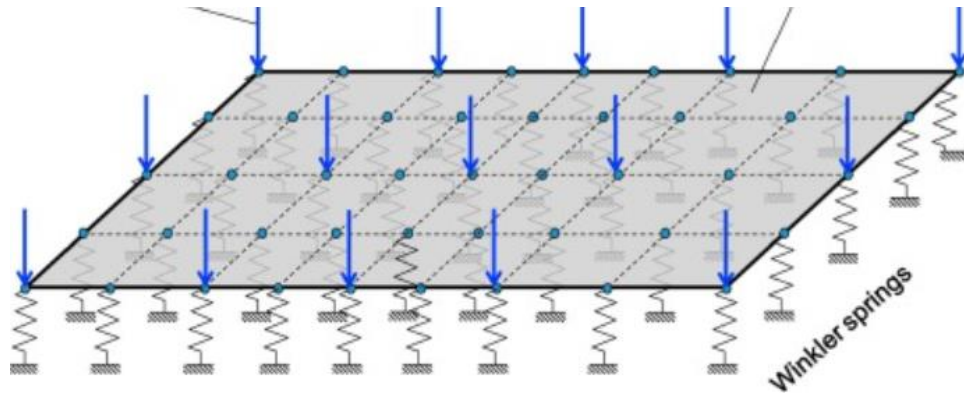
Mat foundation supporting vertical elements spanning multiple bays.
